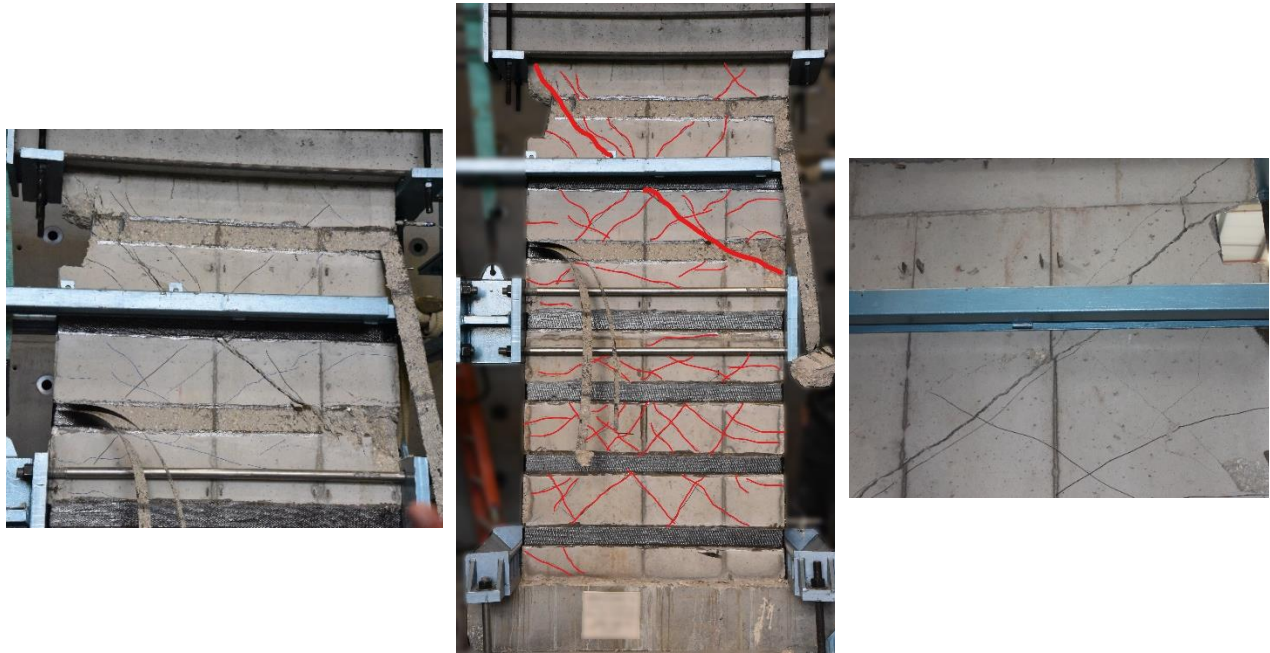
Failure mode H-C21-1 Specimen.
